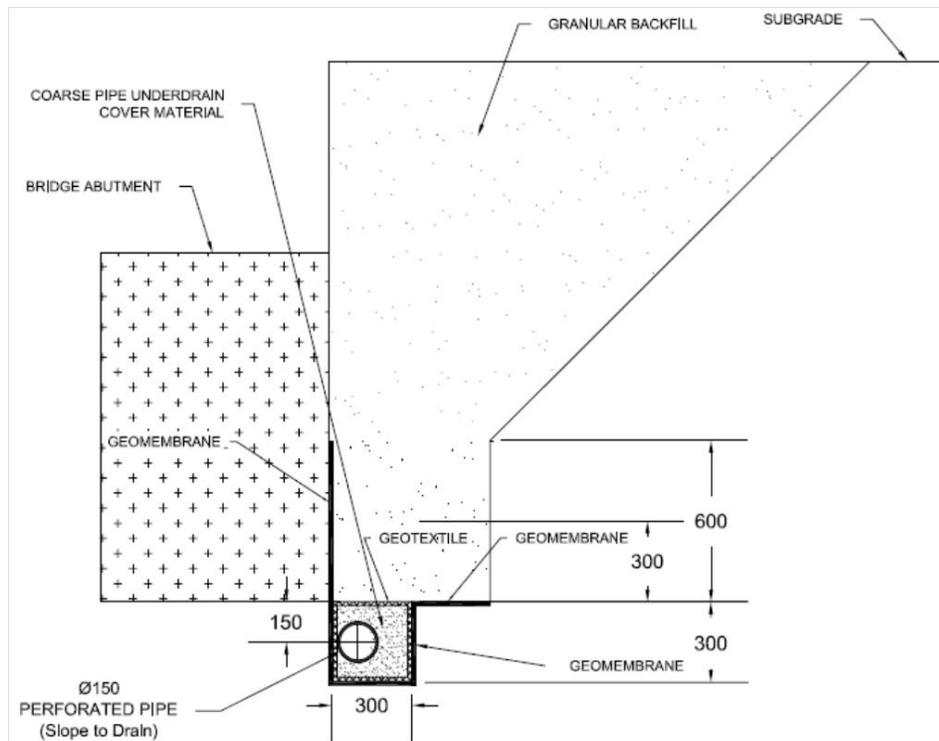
Proposed Abutment Backfill Drainage System with Geomembrane and Graded Granular Filter (units in mm: 300 mm≈12 in.)
